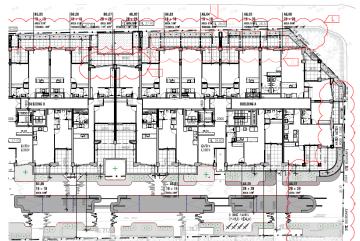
Front portion of the ground floor (comprising Building A and part Building B)
